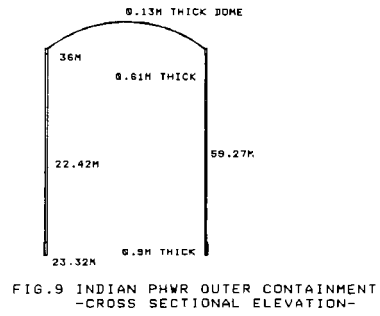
INDIAN PHWR OUTER CONTAINMENT - CROSS SECTIONAL ELEVATION -
